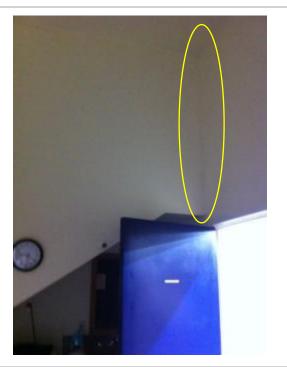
Hairline Cracking around Portal Column in Main Boat Shed
